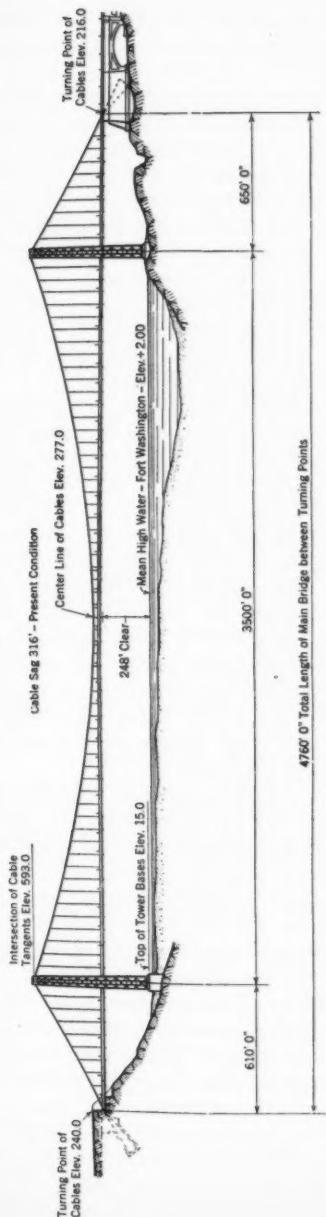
GENERAL PLAN AND ELEVATION OF BRIDGE PROPER.
